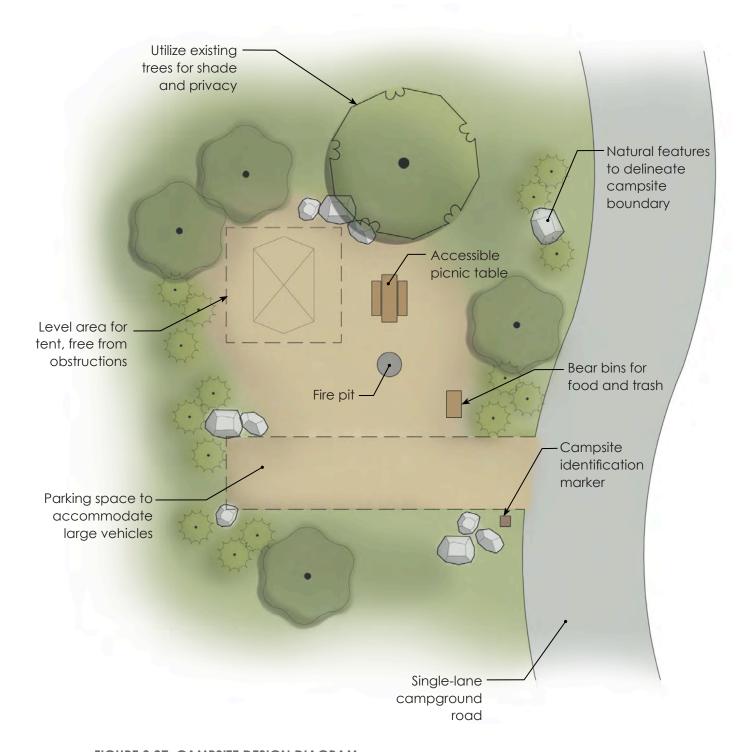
CAMPSITE DESIGN DIAGRAM
